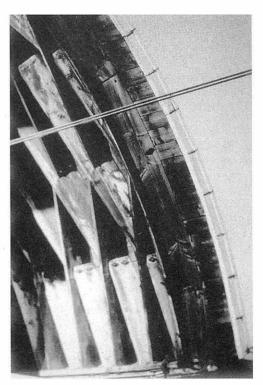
Nørrebro Station designed by KT Seest with Zollinger wooden construction, covered with asphalt roof paper and the façade clad by green-coloured plaster.
